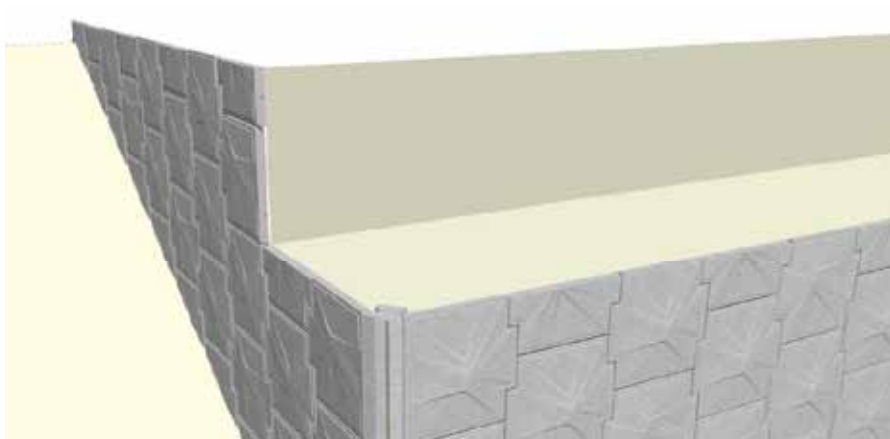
Perspective of MSE wall illustrating two patterned panels abutting the corner unit and two patterned full panels on wall faces.
